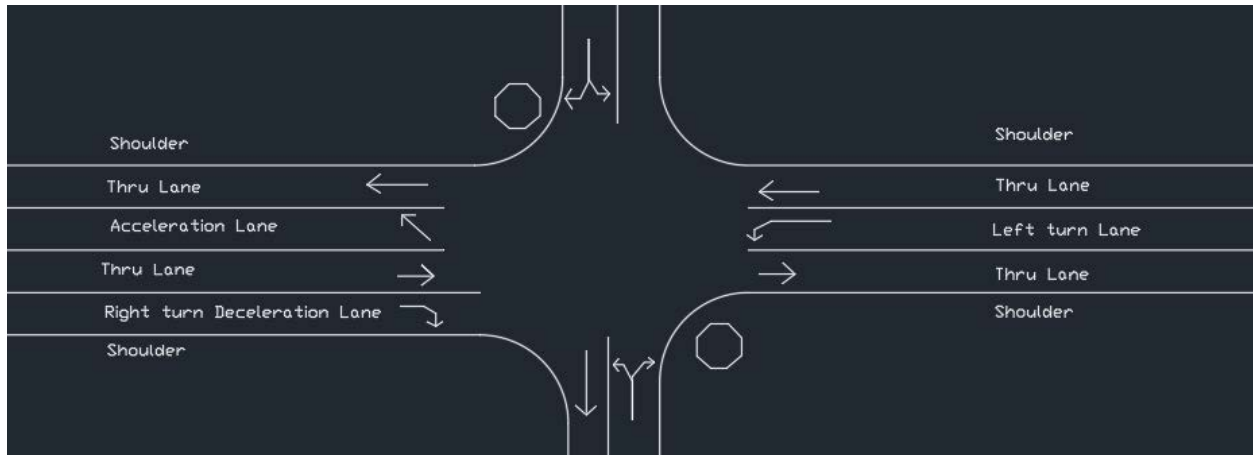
Conceptual Intersection Layout for Proposed Project (not to scale)
